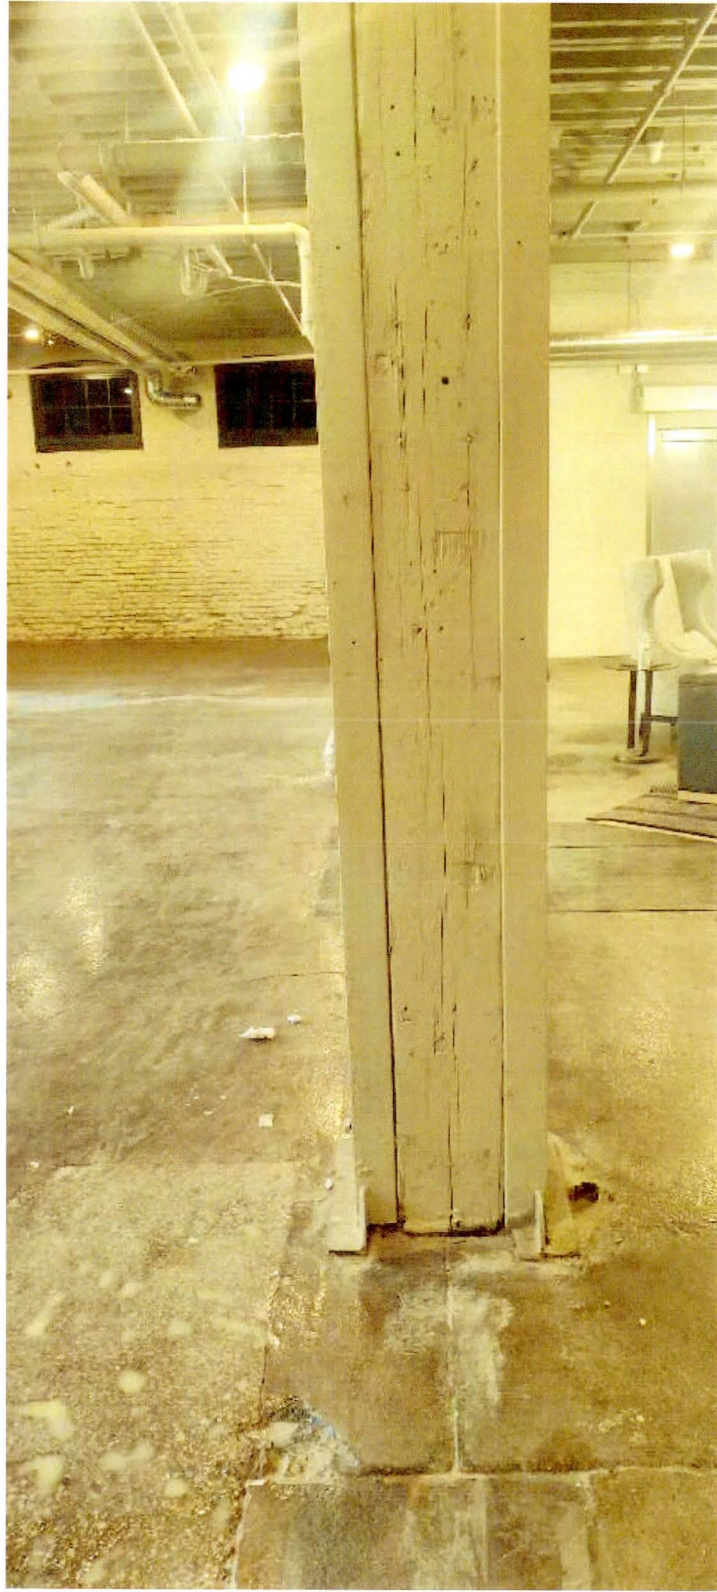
Unit 1036 - Wooden Pillar and cracks in bedroom 1
